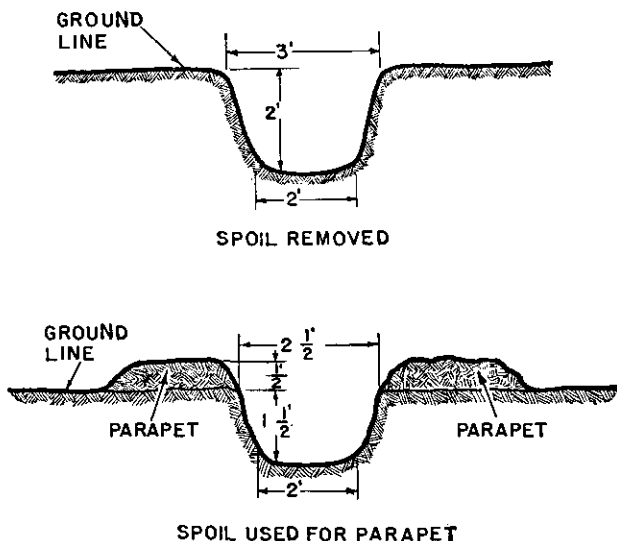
Shallow connecting trench. (Camouflage omitted.)
